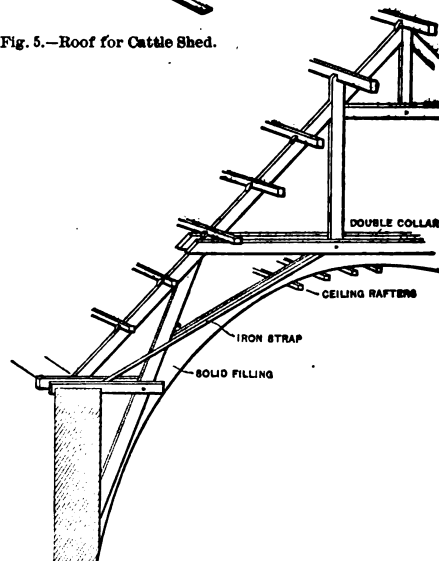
Roof Designed to be Employed with a Barrel Ceiling.
